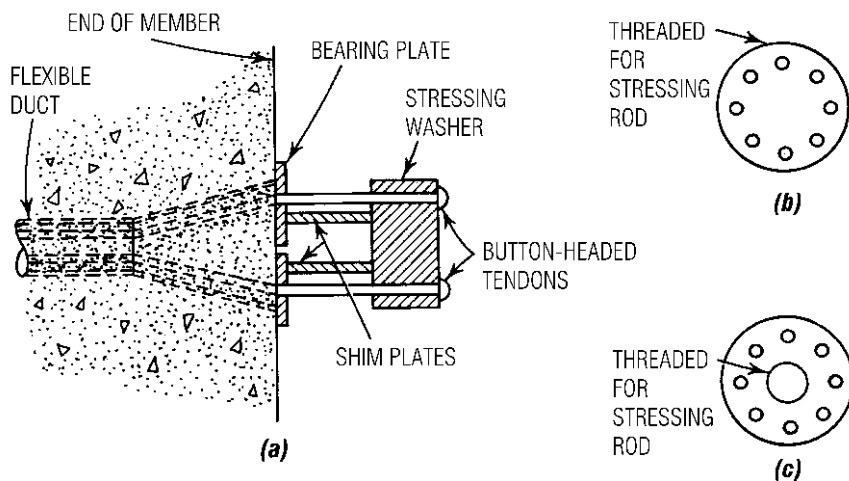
Detail at end of prestressed concrete member. (a) End anchorage for button-headed wires. (b) Externally threaded stressing head. (c) Internally threaded stressing head. Heads are used for attachment to stressing jack.
